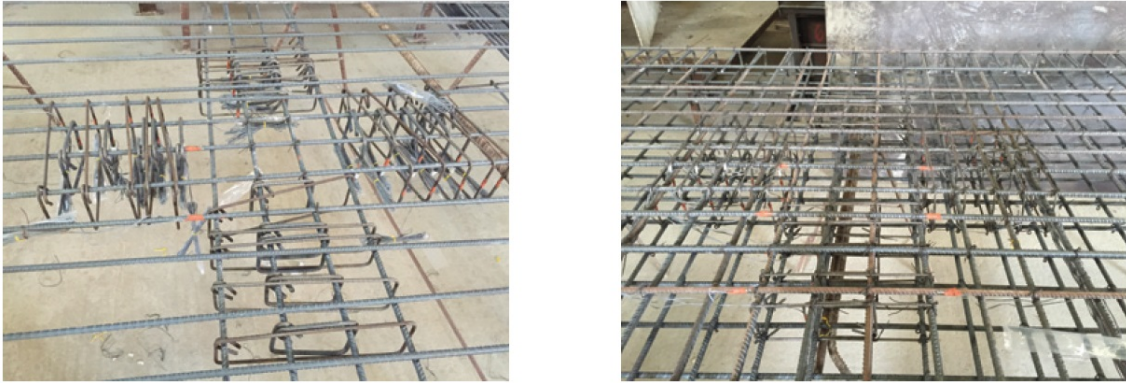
Stirrups used in specimens C-50 STR2 and C-50 STR4 (images from Ornelas 2017)
